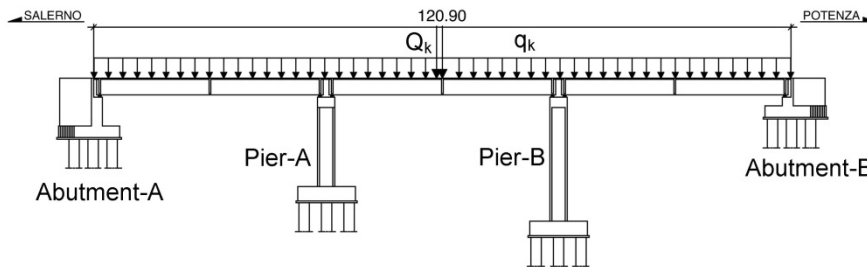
Arrangement of highway live load in NTC 2008 in longitudinal direction
